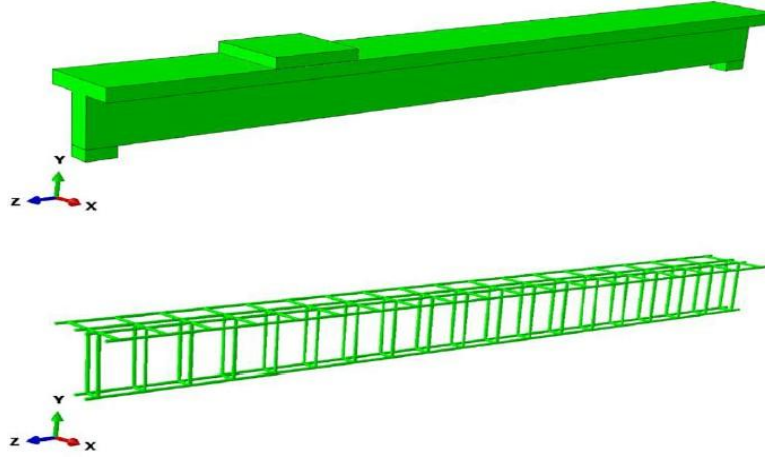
Finite element mesh configuration of the reinforced concrete T-beam
